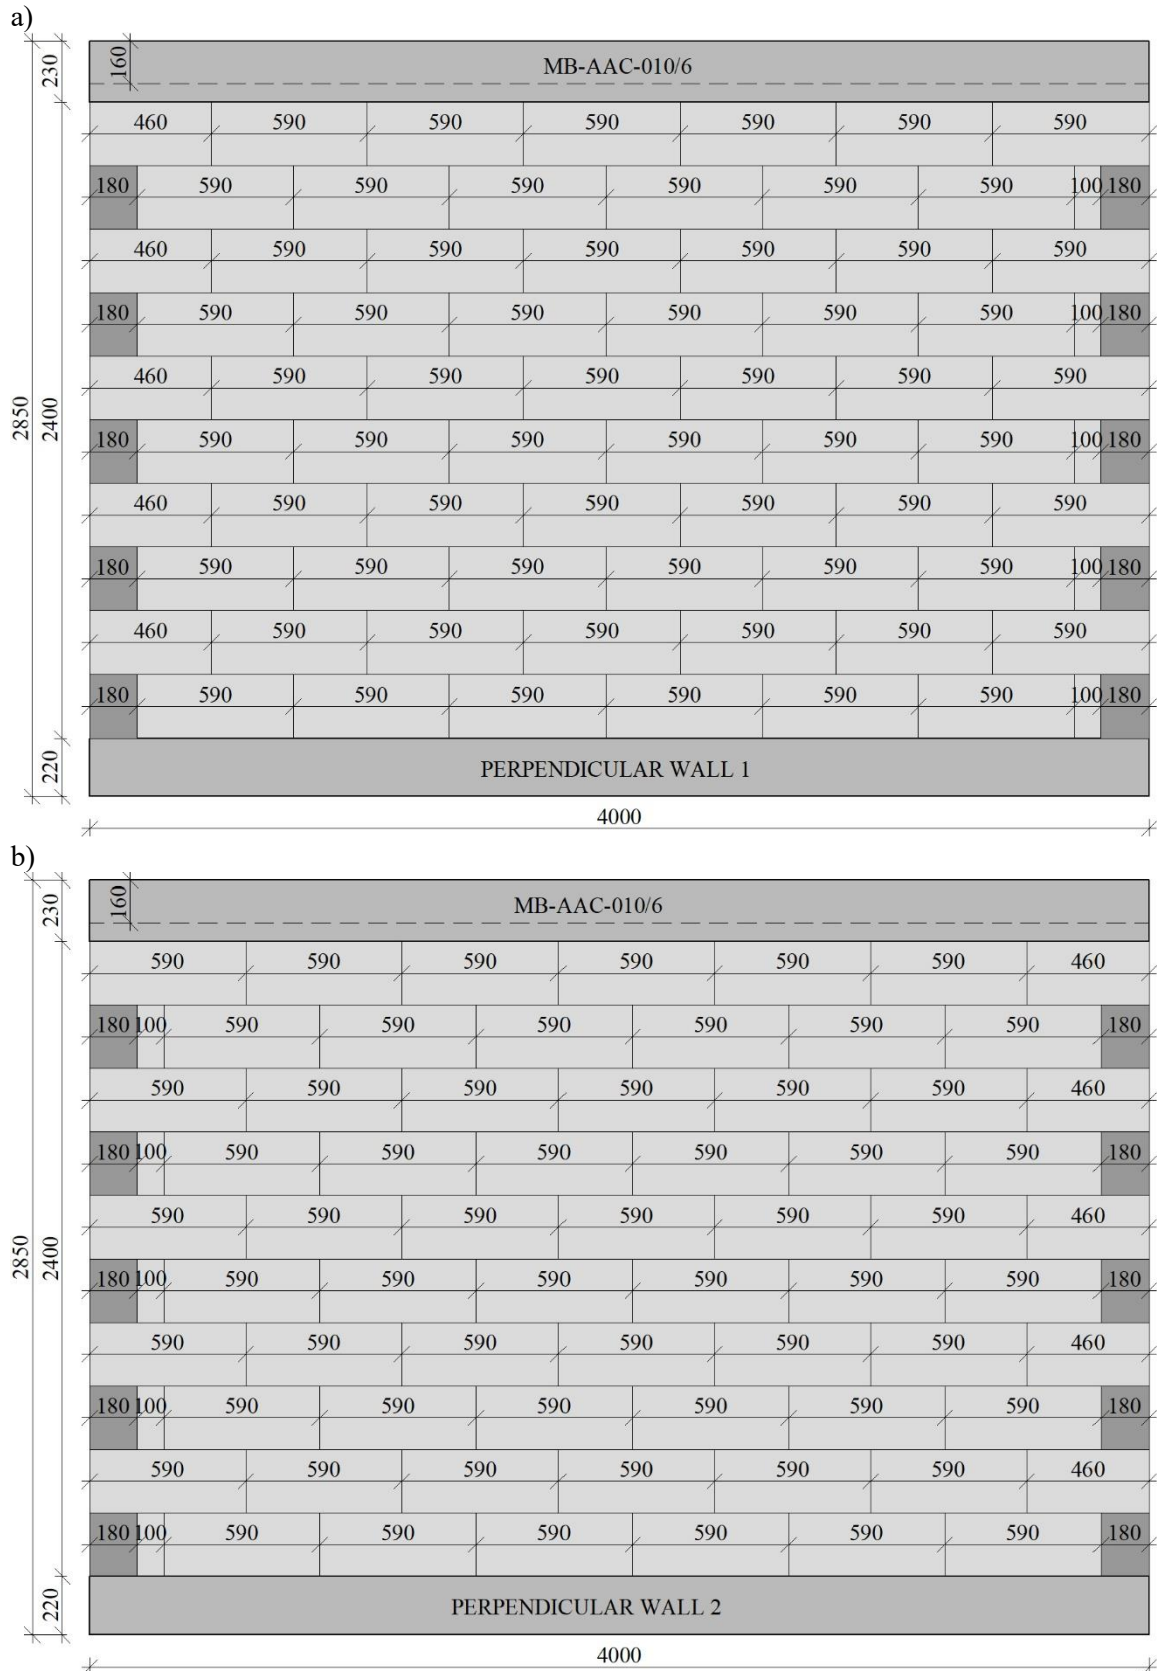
Design of the MB-AAC-010/6 model: a) perpendicular wall 1, b) perpendicular wall 2
